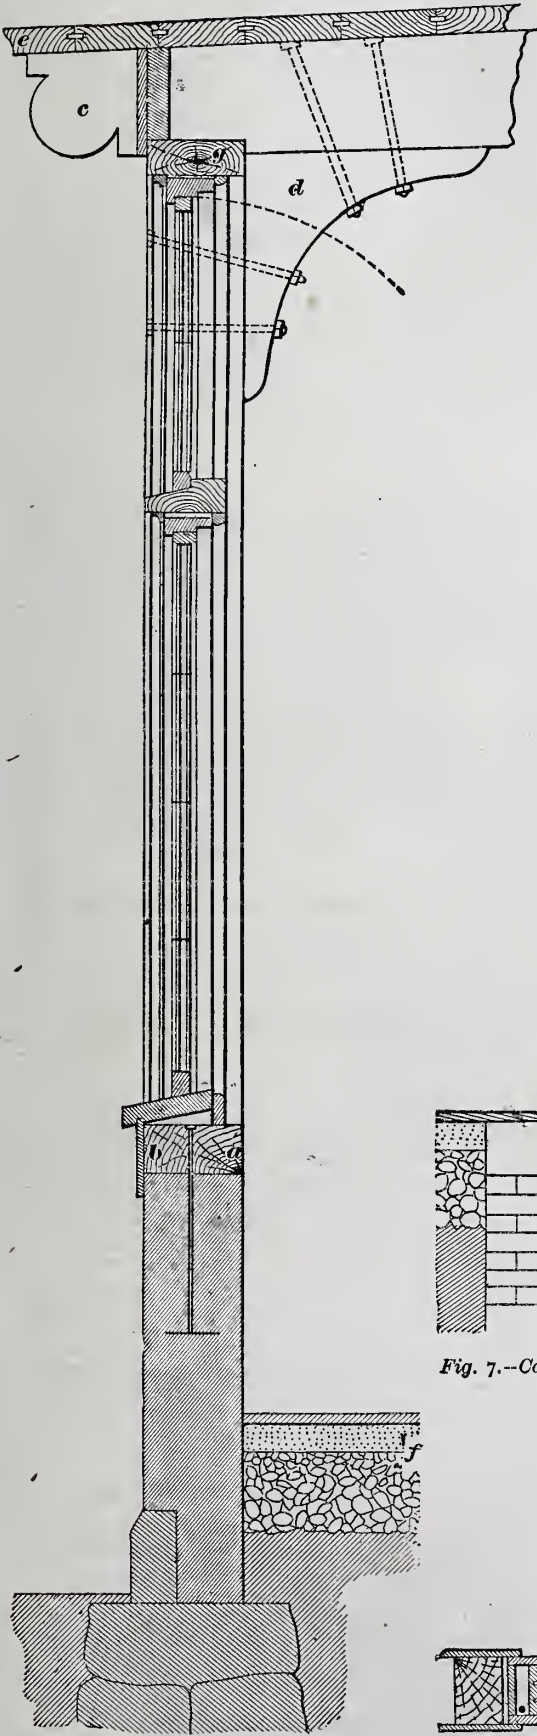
Section Through Window.—Scale, 1/2 Inch to the Foot.
